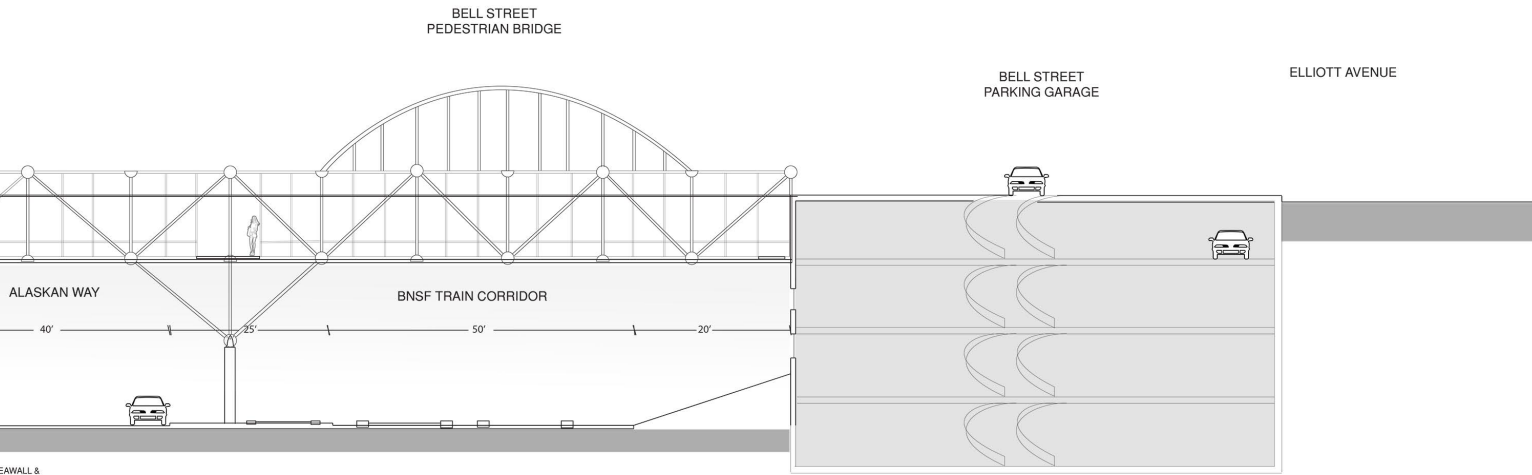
Cross Section between Elliott Avenue and the Cruise Ship Terminal in Belltown, Before Context Changes Are Made.
